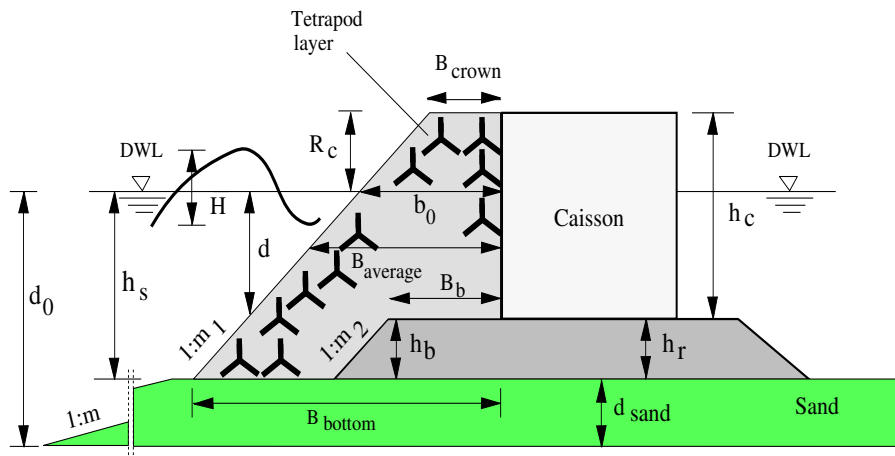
Typical section of horizontally composite breakwater (Japanese type).
